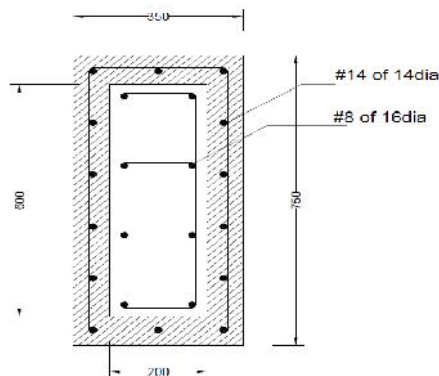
shows the rebar percentage after section enlargement is done. Minimum 75mm thick jacket must be provided for the ease of construction and concreting hence the dimensions of the columns will increase by 150mm i.e. 200x600mm columns will become 350x750mm after jacketing. Enlargement in section will increase the column capacity and hence minimum percentage of steel if sufficient i.e. 0.8% of enlarged section as shown in figure7.
